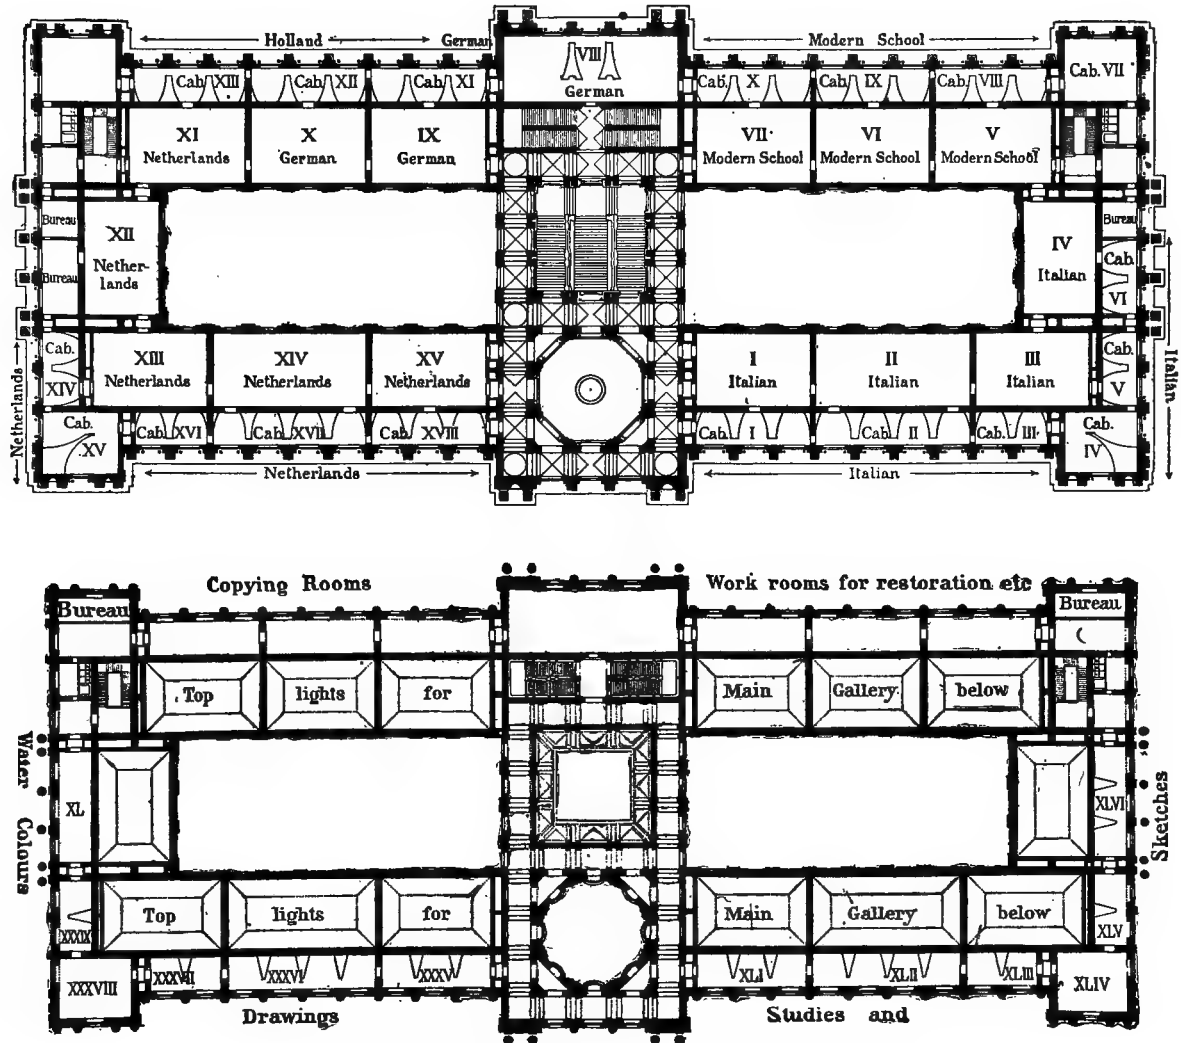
Plan of the first and second floors of the Imperial Gallery, Vienna.
